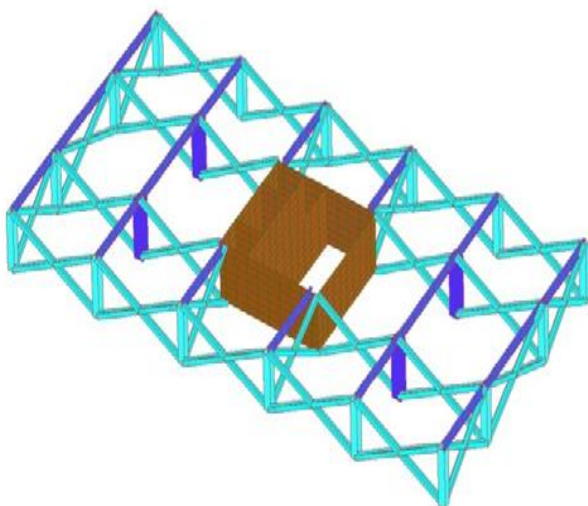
3D view of Outrigger and belt truss belt truss
